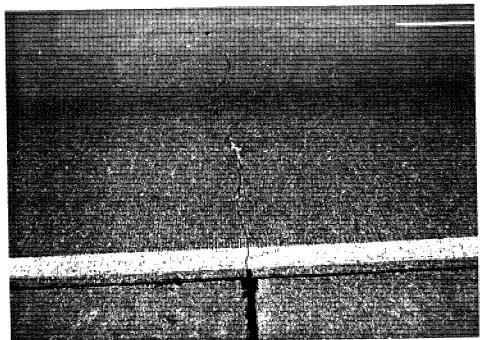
Typical crack in section MI1-4, recycled concrete on dense-graded base course.
